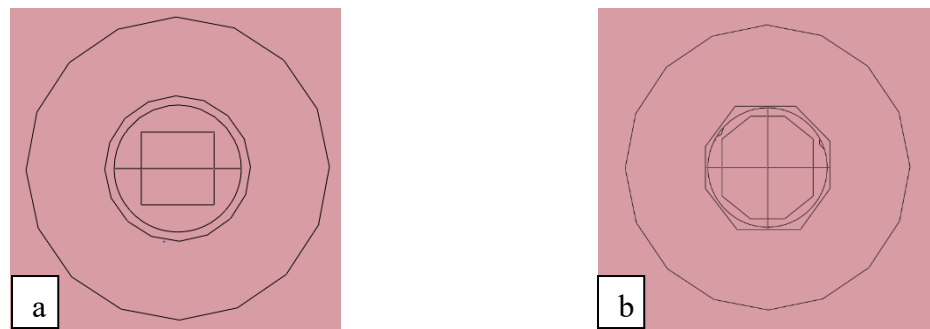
(a) Zones on Prestressed Concrete (PSC) WG Model and (b) Zones on Prestressed Concrete (PSC) WA&WP Models
